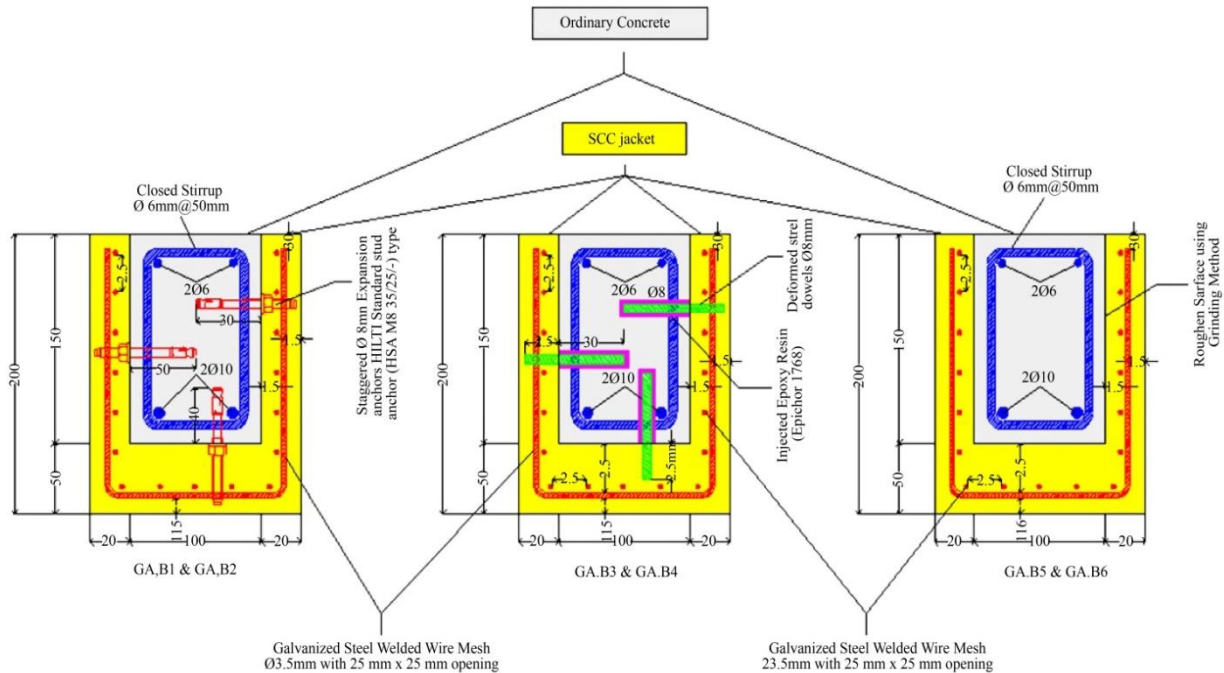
(Group A) strengthened beams (dimensions in mm) (Maraq et al., 2021)
